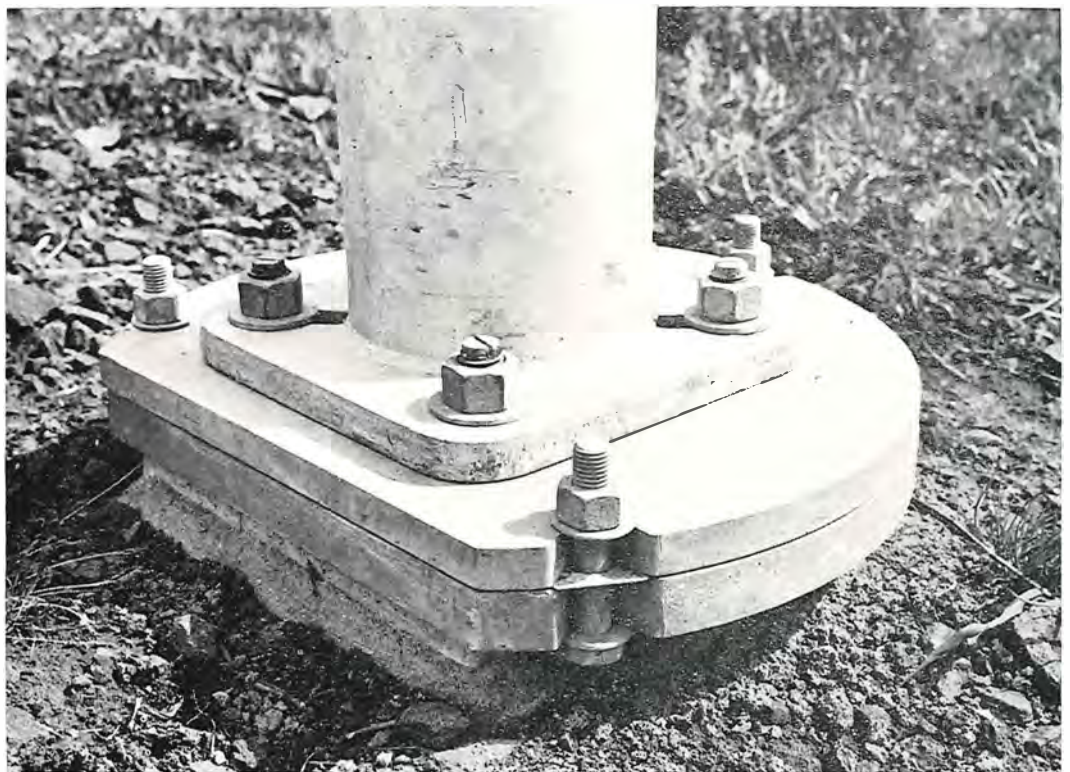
A slip base assembly. In the foreground can be seen the V-notches in the top and bottom slip base plates, the keeper sheet between the plates, and one of the bolts that hold the plates and sheets together.
